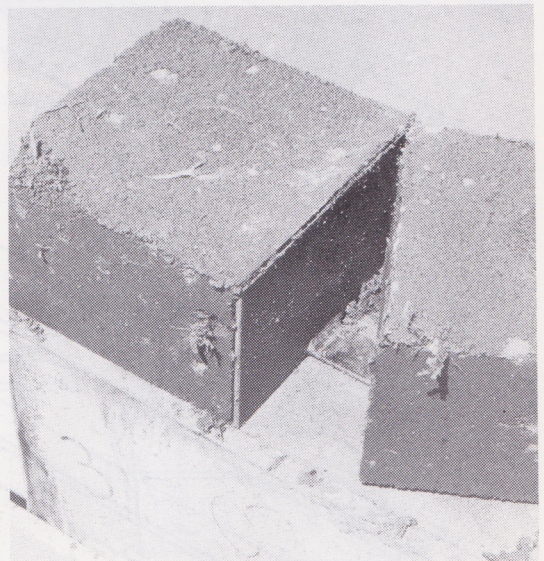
Half size Cinva-ram blocks cast with cutting attachment
